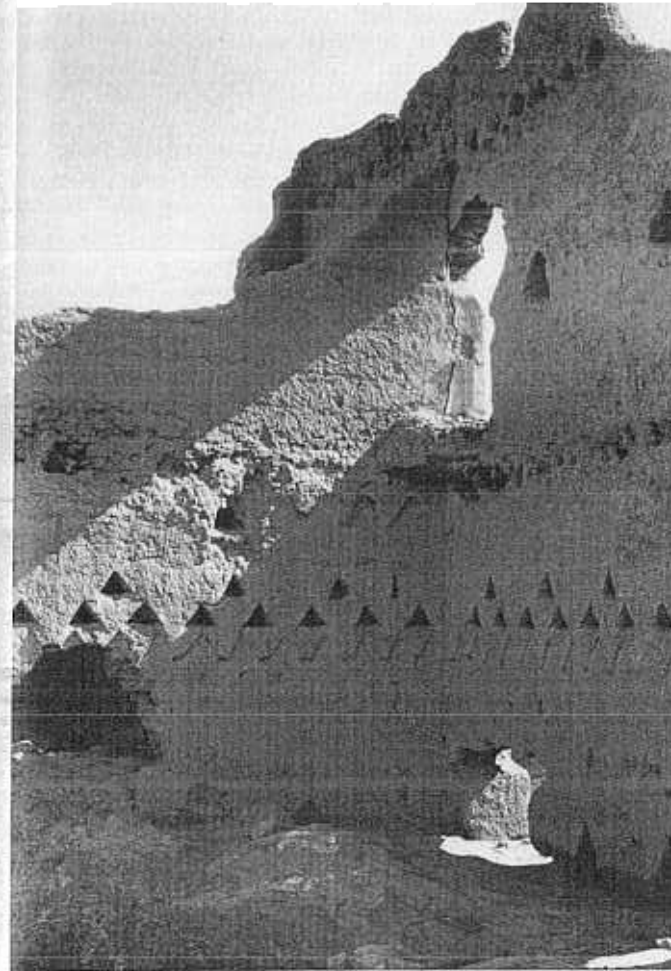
Poor cross wall bonding and inadequate floor construction, Ait-Ben Haddon, Morocco.
